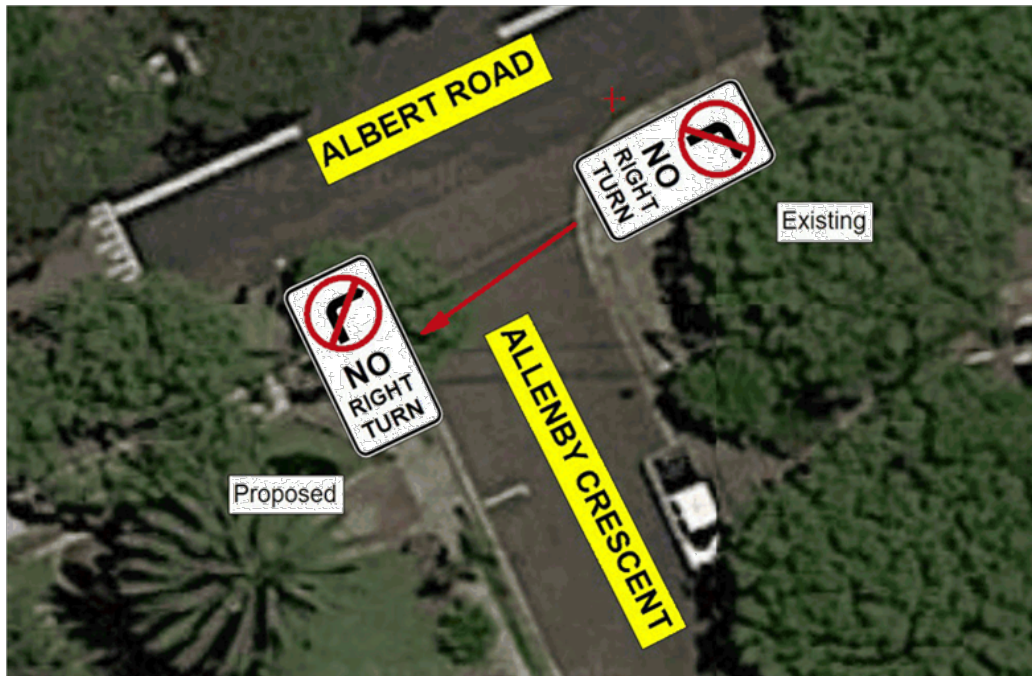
proposed movement of existing sign to face northbound traffic on Allenby Crescent
